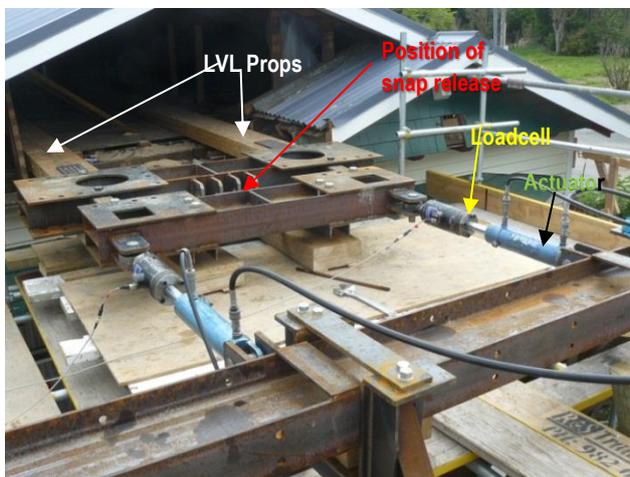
Reaction frame above the scaffold with hydraulic load system, load cells and connector beams with space for snap release.
